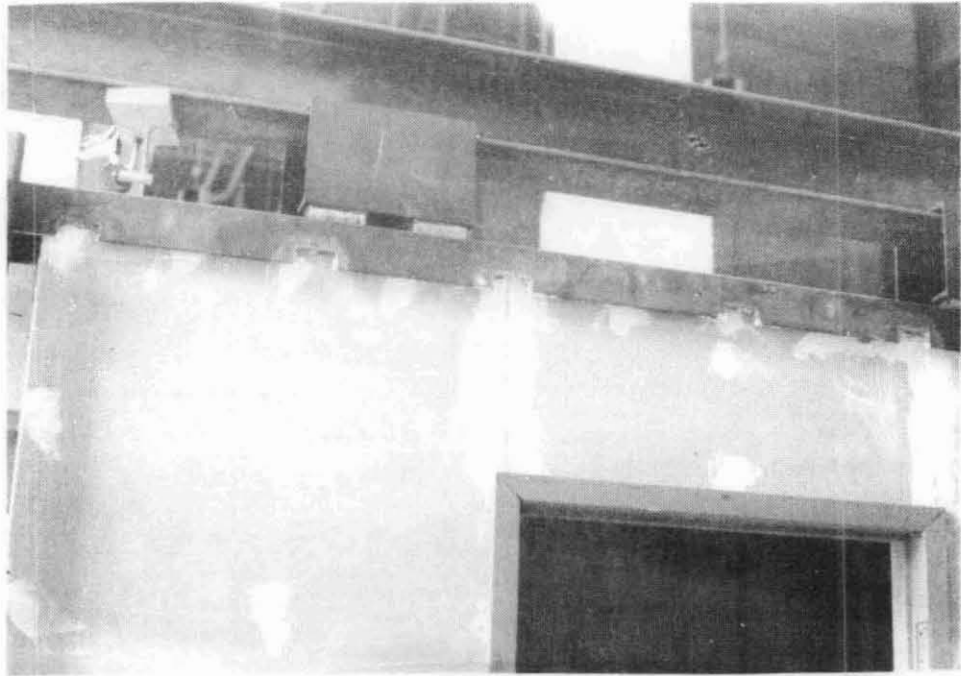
Partition Test Specimen P11: Failure Above Door Opening
